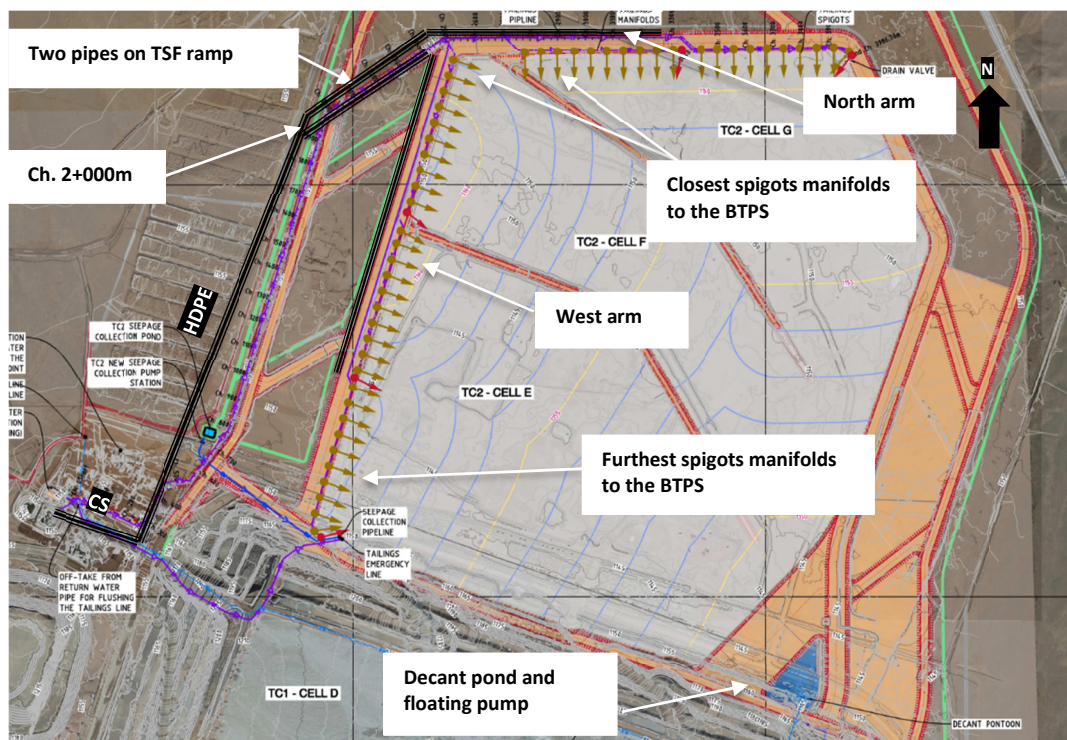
New TSF tailings pipework arrangement (Stage 1)
